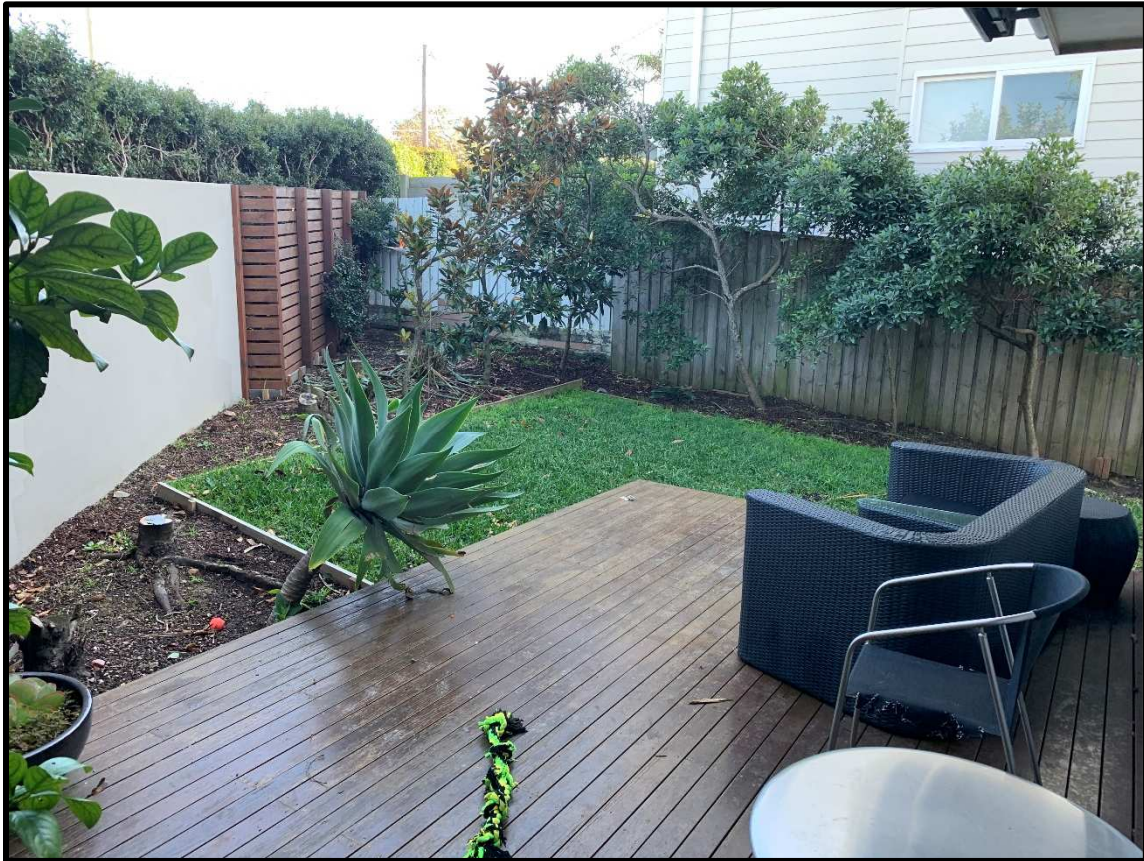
View of north western section of site where pool is to be located, looking north west.
